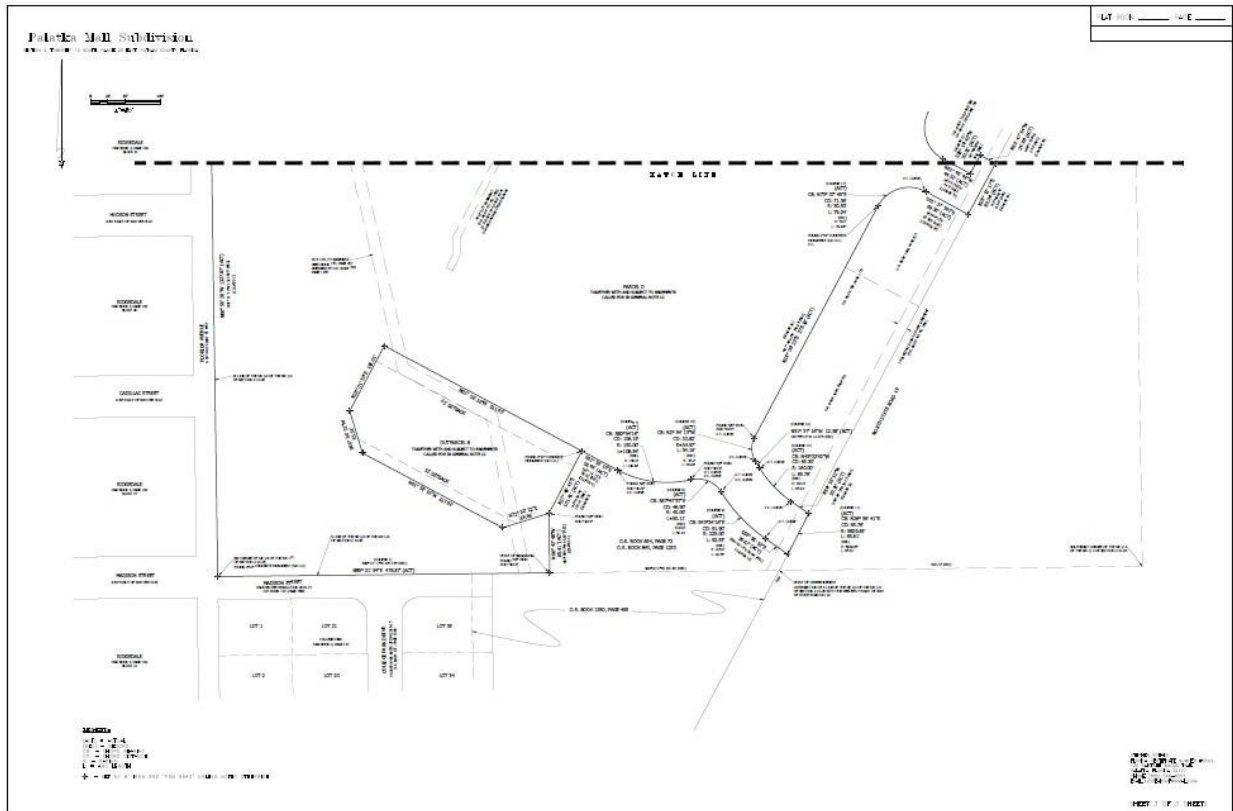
Proposed Preliminary Plat Sheet 3 (A full size plat is available at City Hall)
